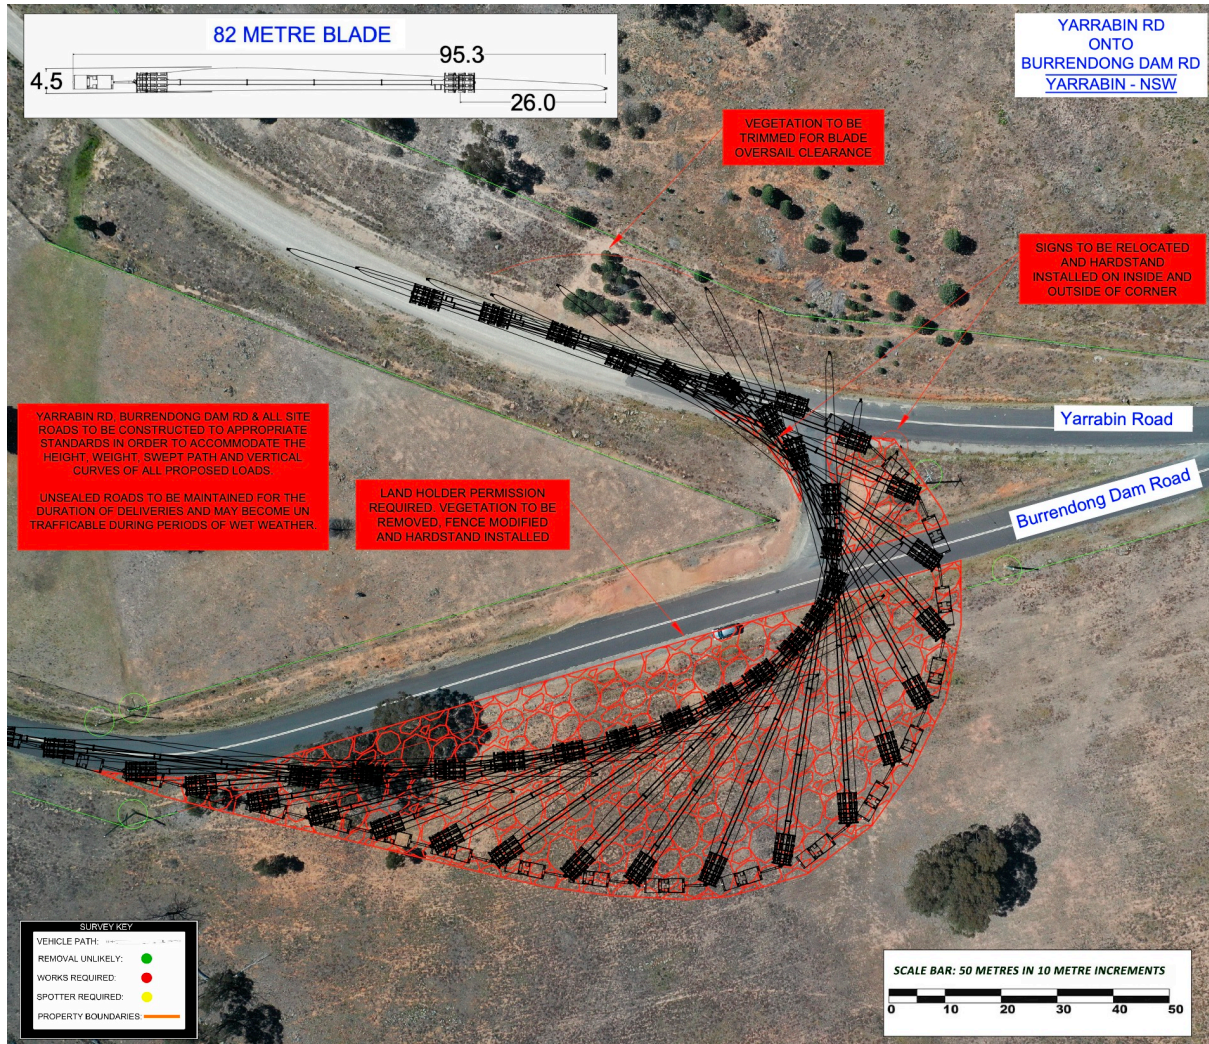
Yarrabin Road onto Burrendong Dam Road
